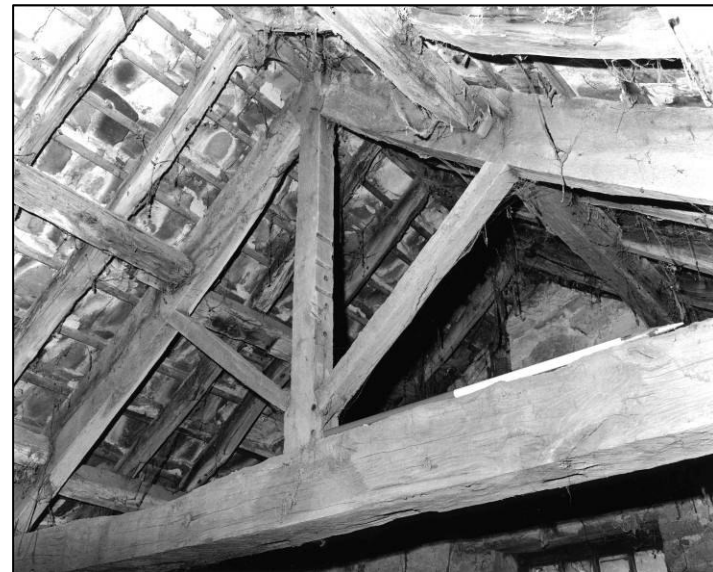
Granary: 2F N cell, S face of N truss, looking N (photo 3/13).
